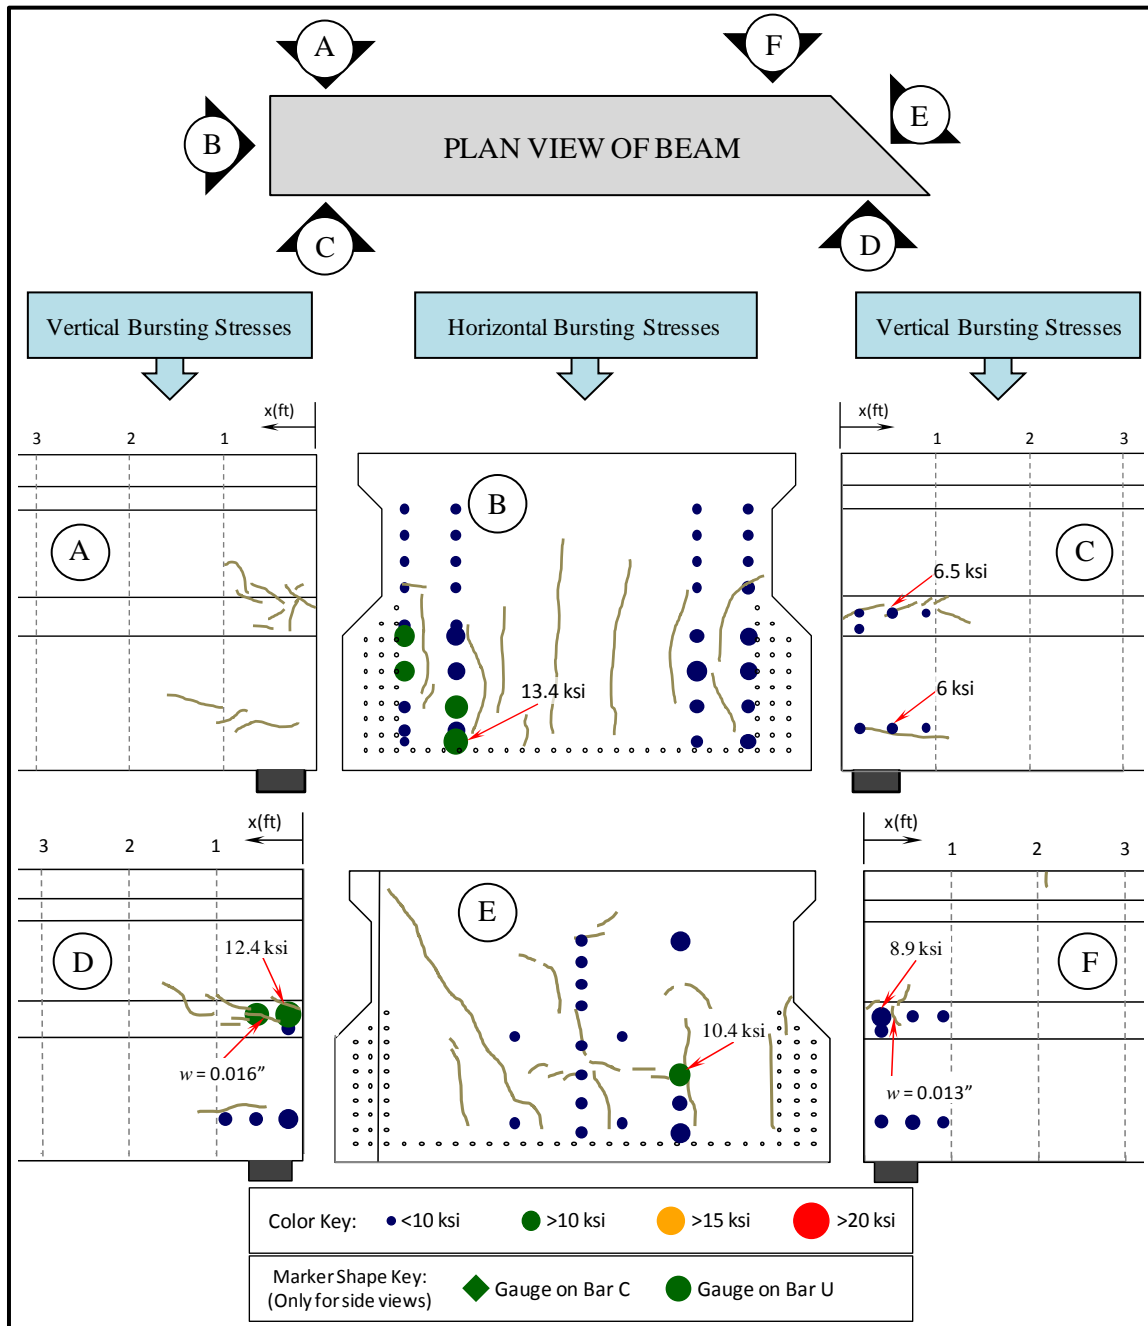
Cracks and stresses registered at the time of prestress transfer in beam specimen 5B40-4
